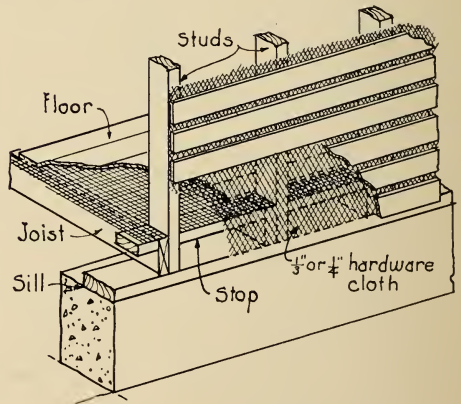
Construction for a corn crib to exclude rats. The ends of studs and joists are nailed together to resist lateral pressure when the crib is filled. Spaces between studs are closed by wooden stops at the floor level. Hardware cloth is placed between joists and flooring and between studs and outside slats. The whole crib is elevated on concrete, field stone, or wooden sills so that the floor is at least 12 inches above ground.
